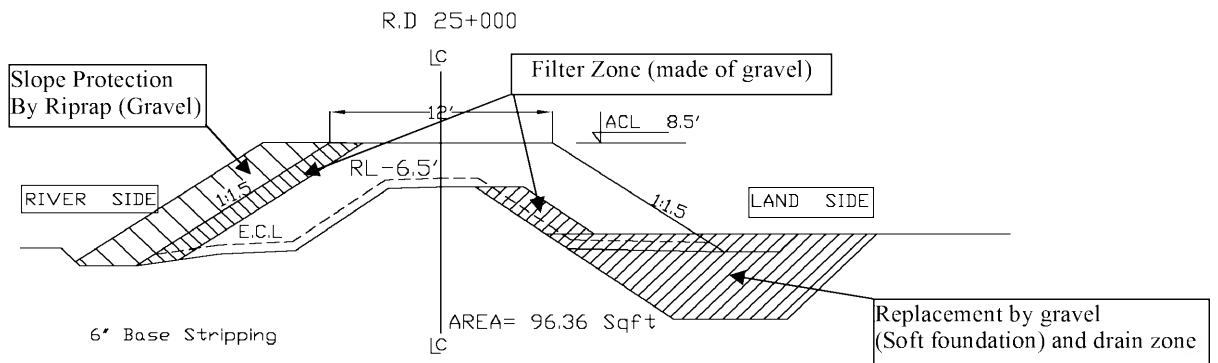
Typical section of polder over old stream-bed and weak foundation
